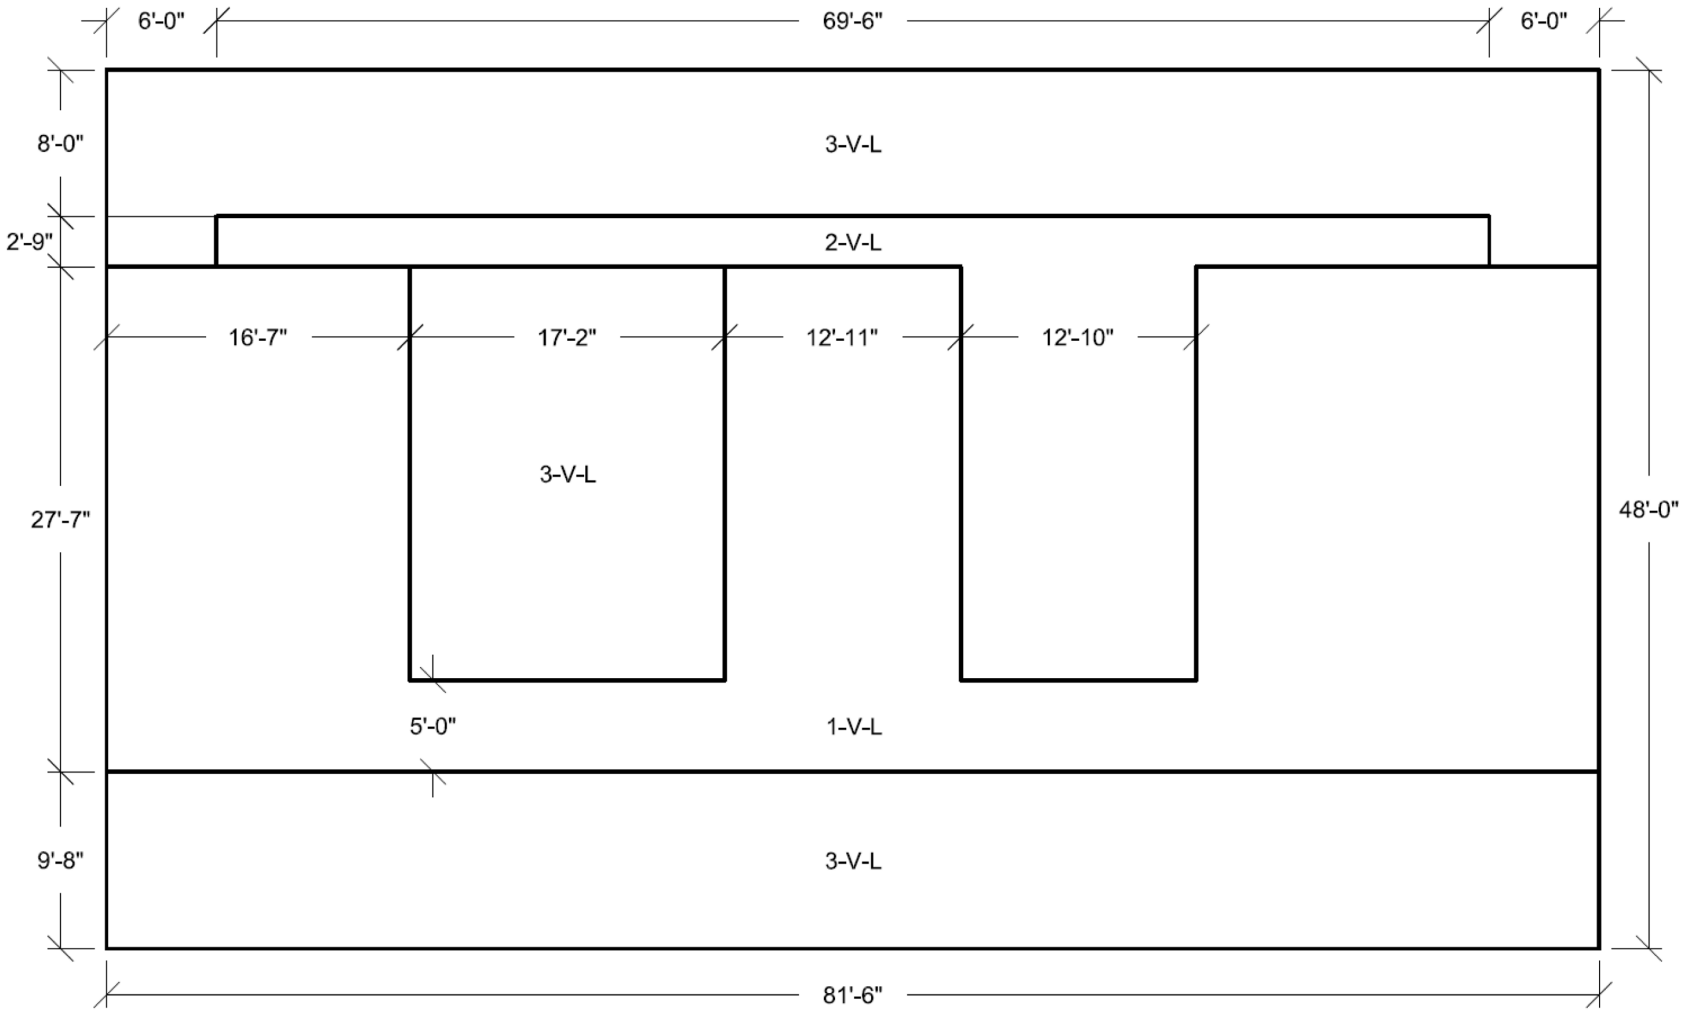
H.6-143 DGFOV Slab 1 Looking Down Vertical Reinforcement Zones Near Side Face
